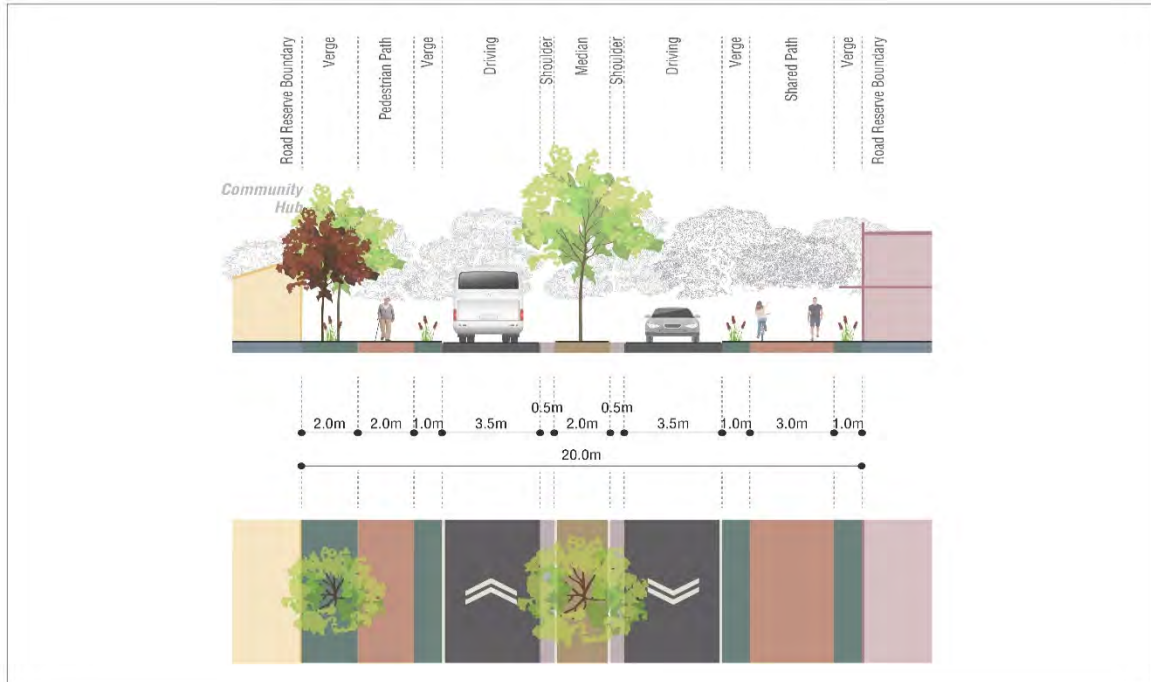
RD12 Raven Street (Milner Road to Maida Vale Road) and RD13 Raven Street (Milner Road to Brae Road) Cross Section
